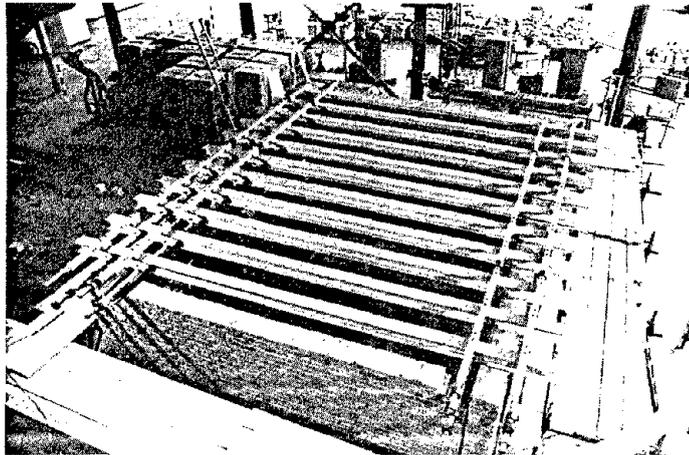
View of the floor beams during construction. The longitudinal bars used to distribute the horizontal forces to the floor beams are visible
